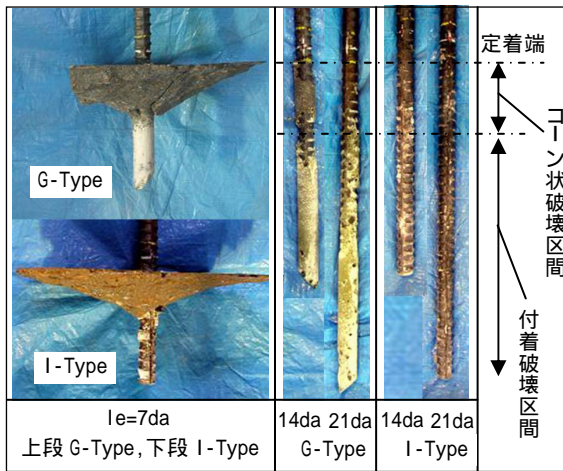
Failure of Concrete Fig. 10 Failure of Bonded Anchor bars
